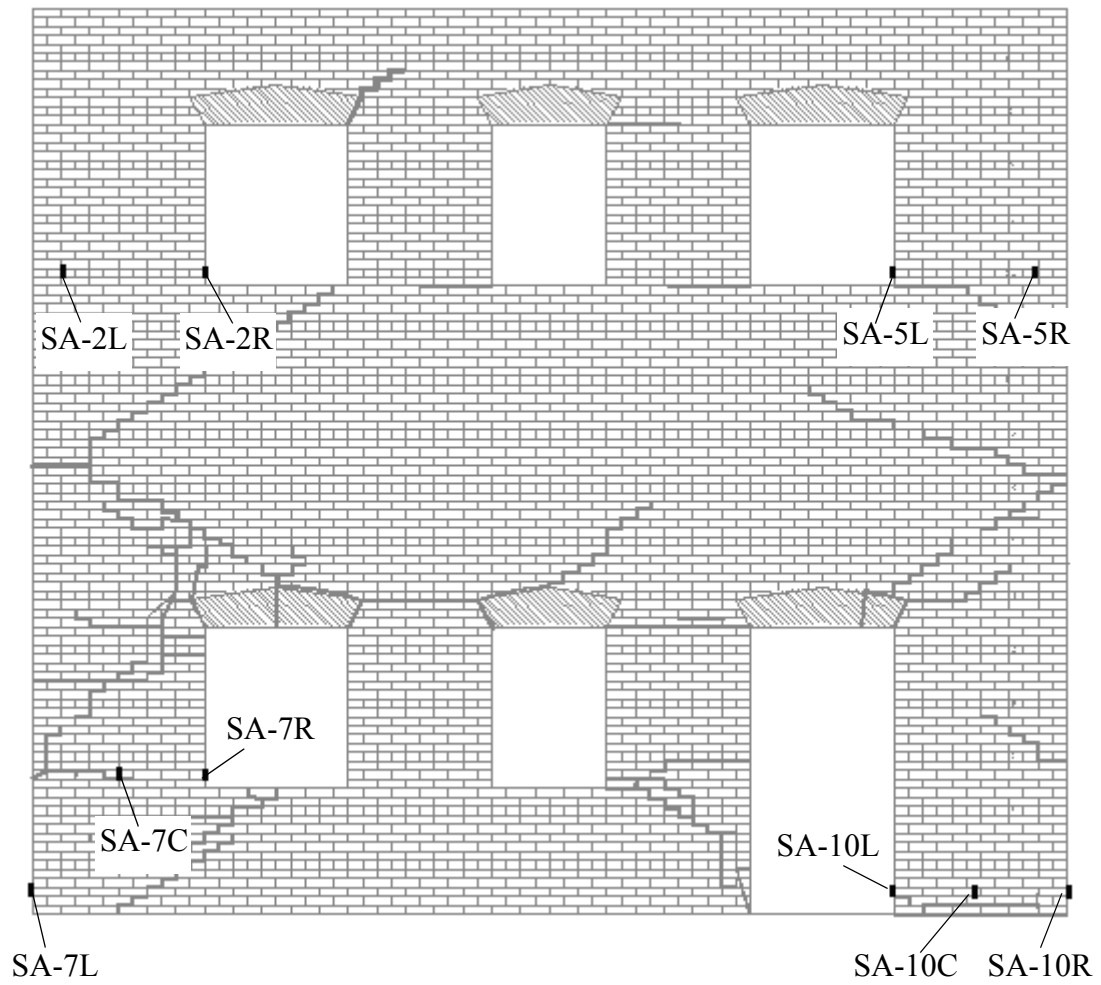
Elevation of Wall A illustrating the location of strain gages.
